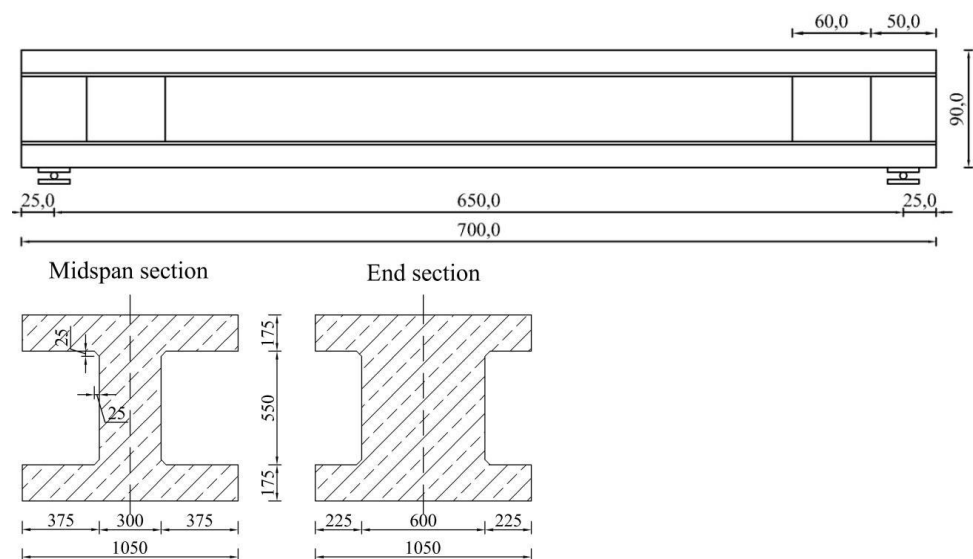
Case PB7. Elevation and cross-sectional details (dimensions in cm).
